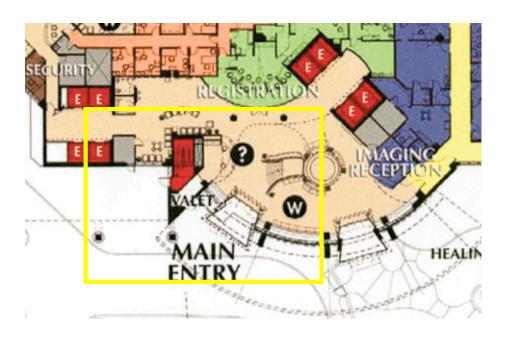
Floor Plan of The First Floor of Monroe Carrell Jr. Children's Hospital at Vanderbilt
